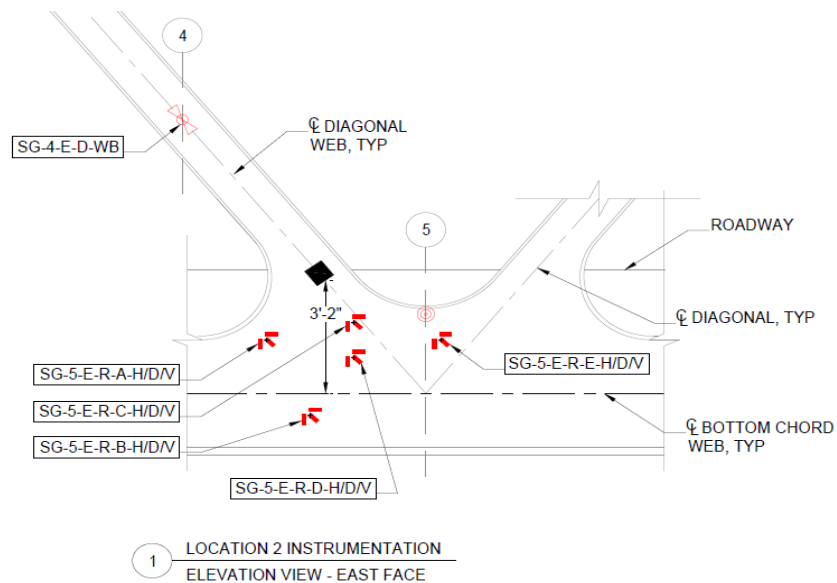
Memorial Bridge Instrumentation Plan – Lower chord connection [37]
